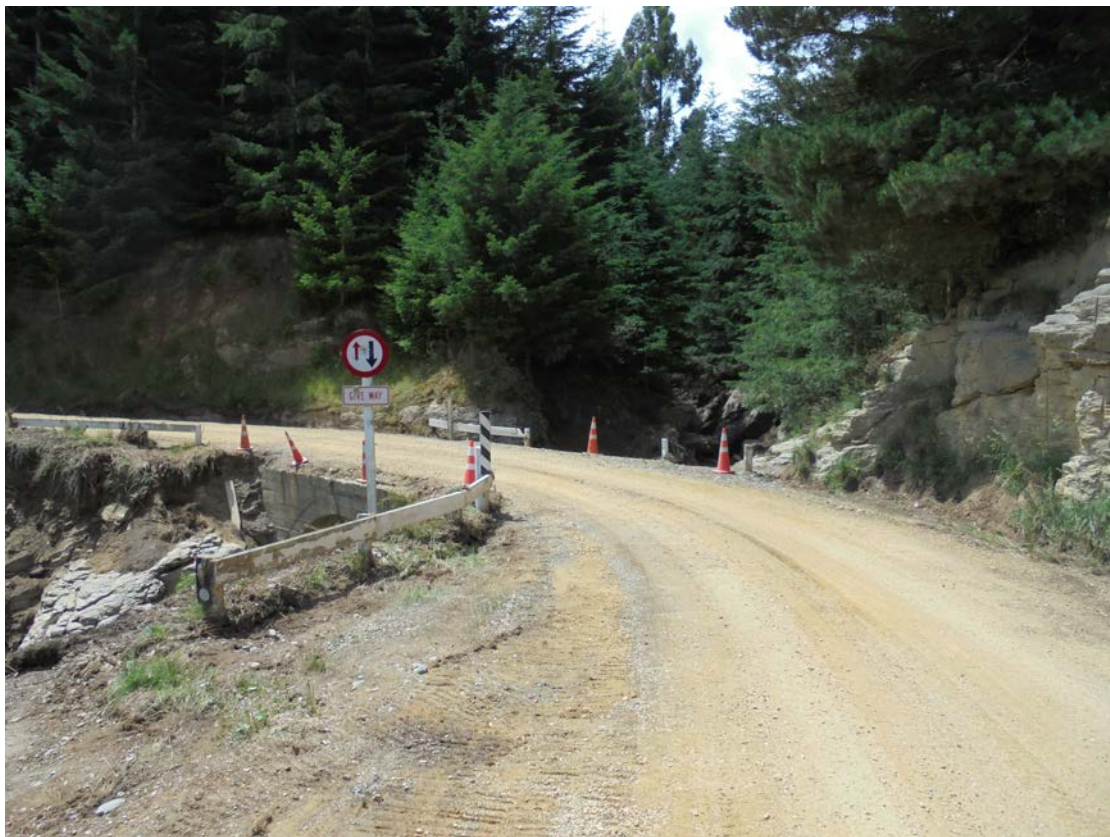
A small bridge across Tima Burn about halfway up the catchment. The stream bed is 2 to 3 m below the bridge deck. The damage to bridge railings provide evidence of flows down the creek large enough and fast enough to rip railings and posts off the top of the bridge structure (Photo: S.Dellow 13/12/2017).
